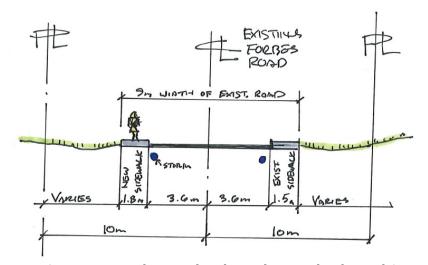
Existing Forbes Road in the Forbes Road Industrial Area
